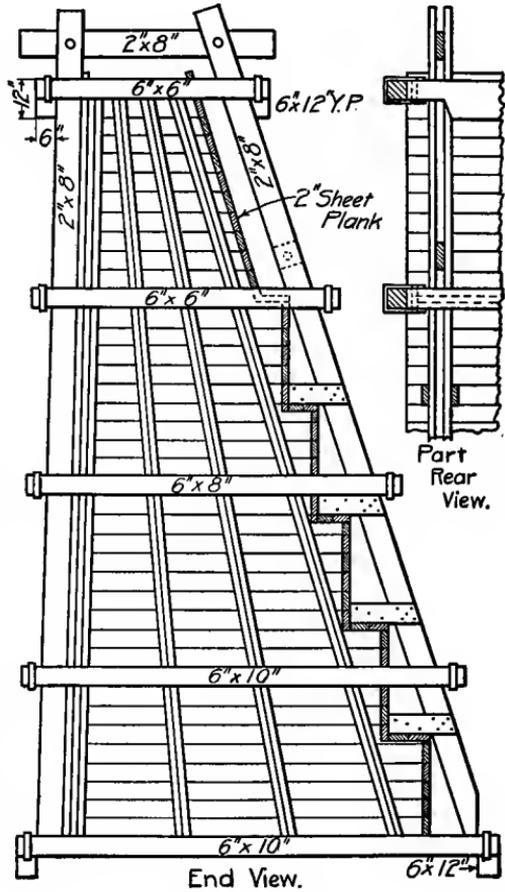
FORM FOR NEW YORK CENTRAL WALL.
